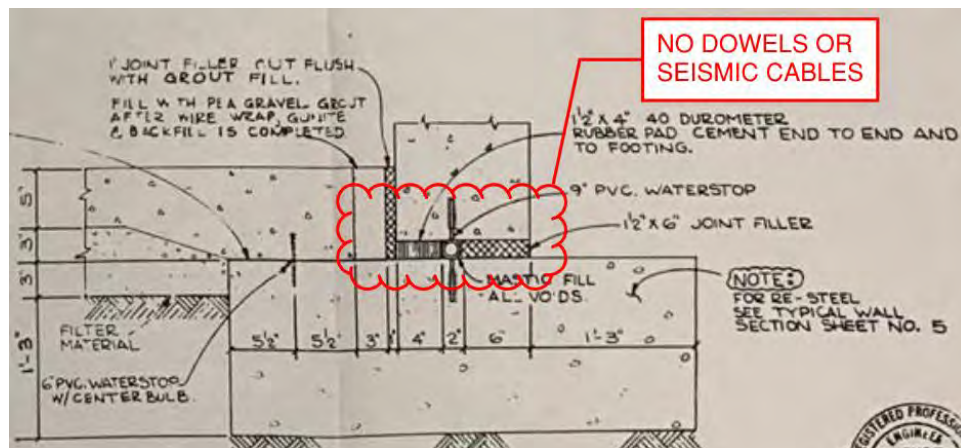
Base of Wall to Foundation Connection without Dowels or Seismic Cables
